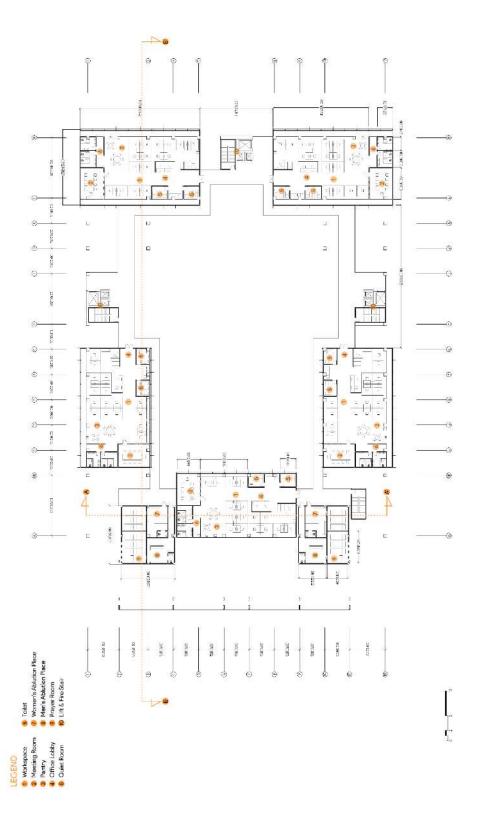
4th Floor Plan (Source: Personal Illustration)
